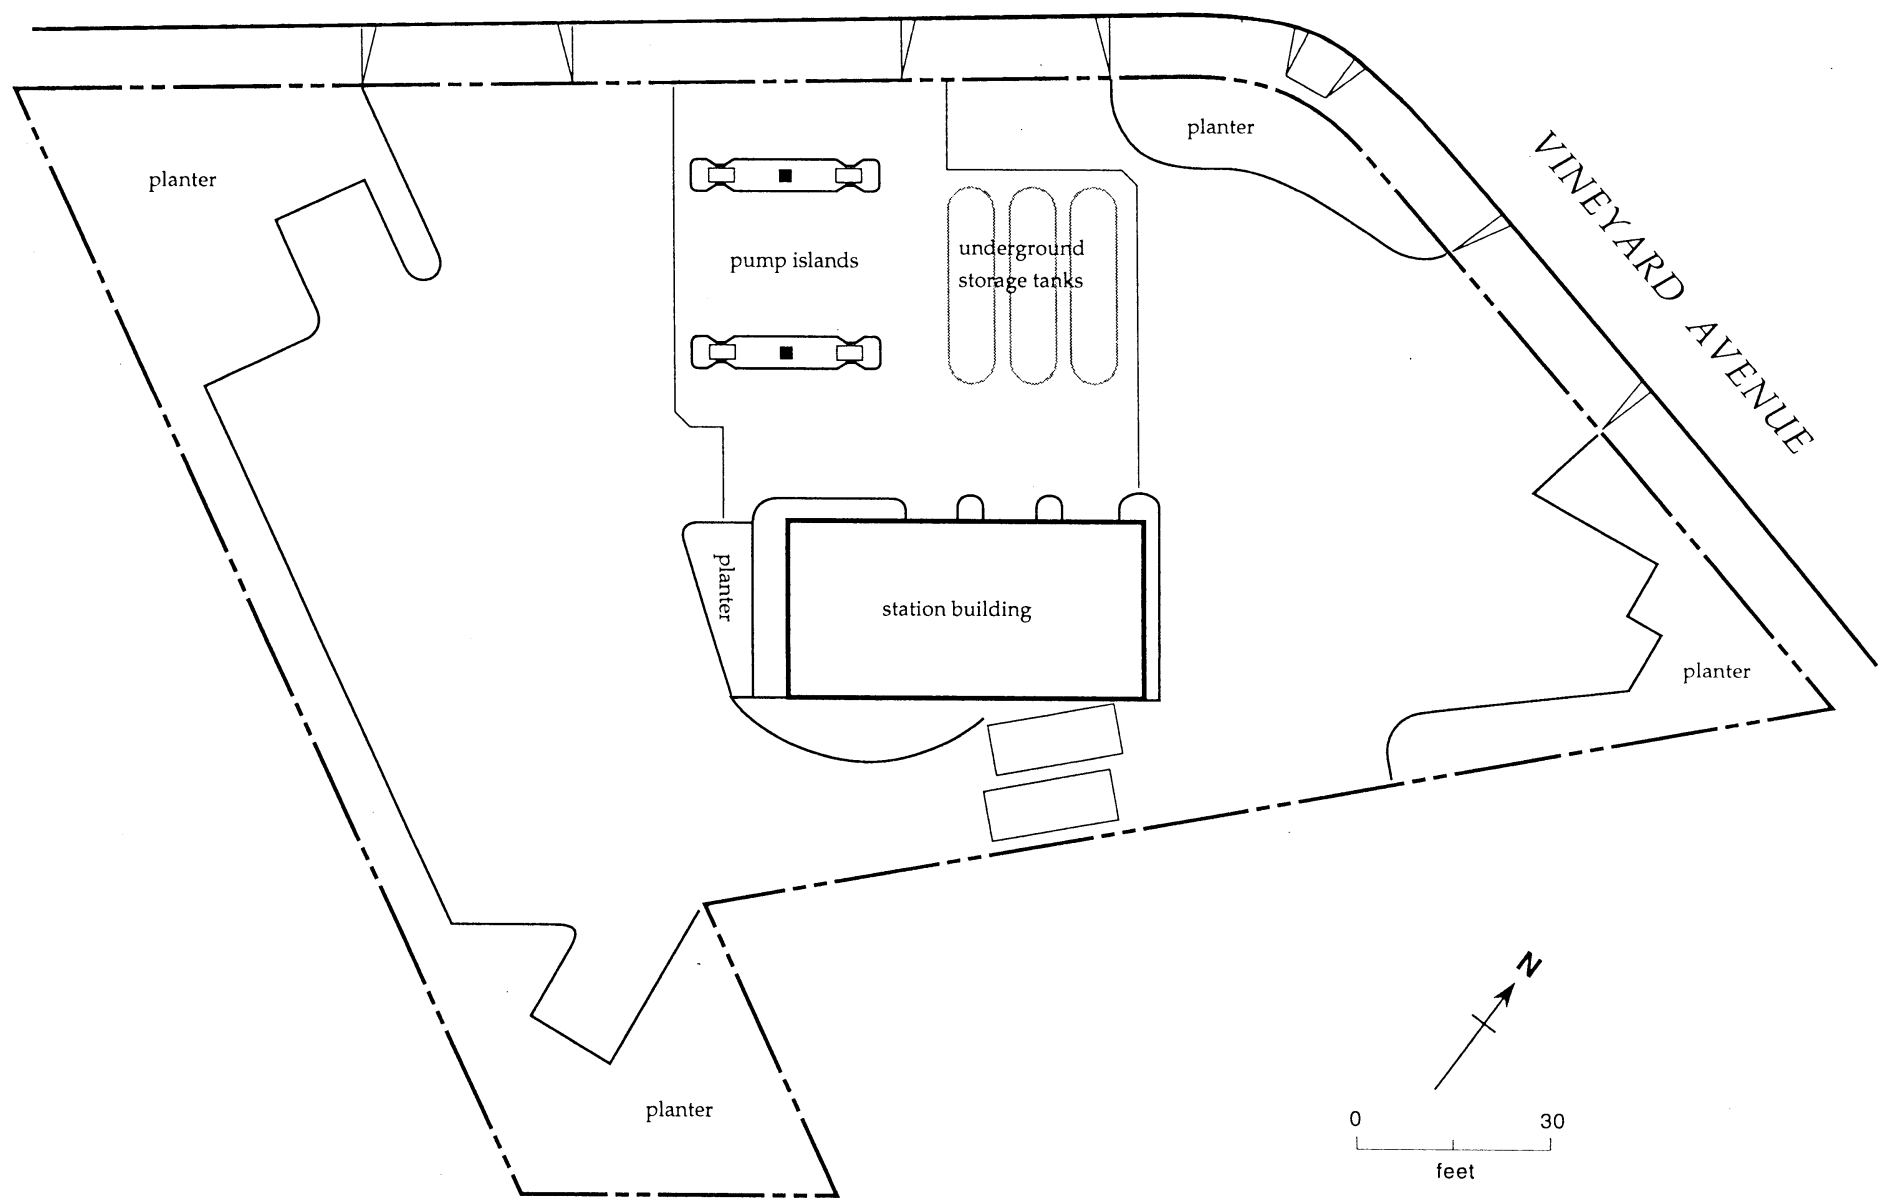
Site Layout - Shell Service Station WIC #204-6138-0303 - 4226 First Street, Pleasanton, California
